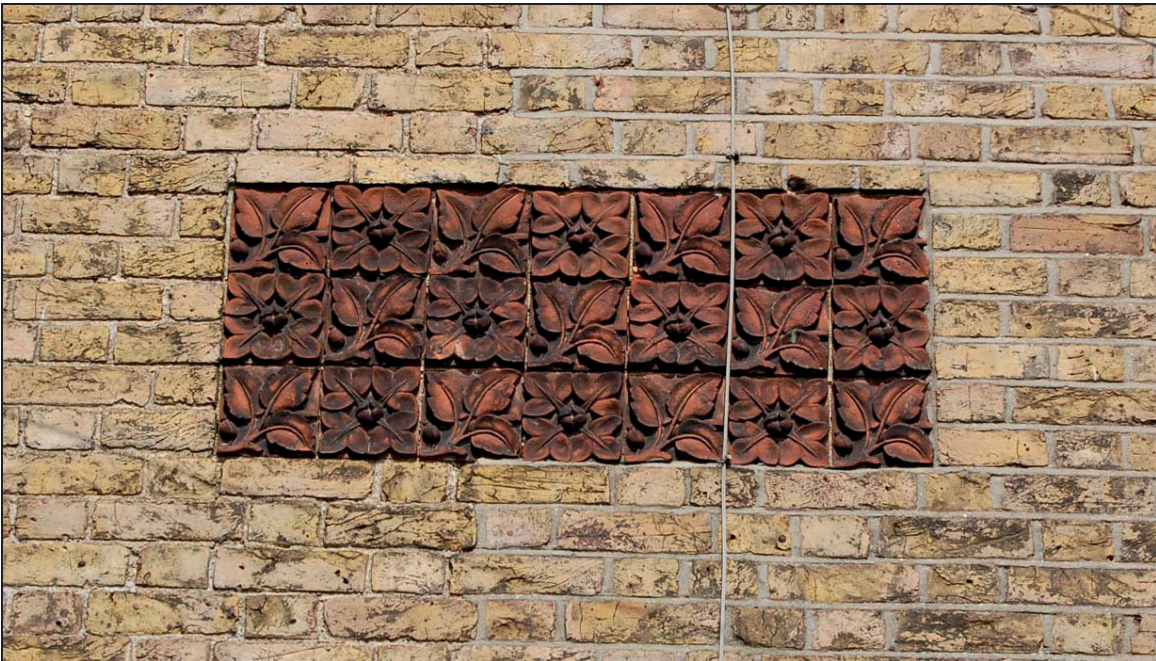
Detail of rectangular tiled panel (cottages 3 and 4)
